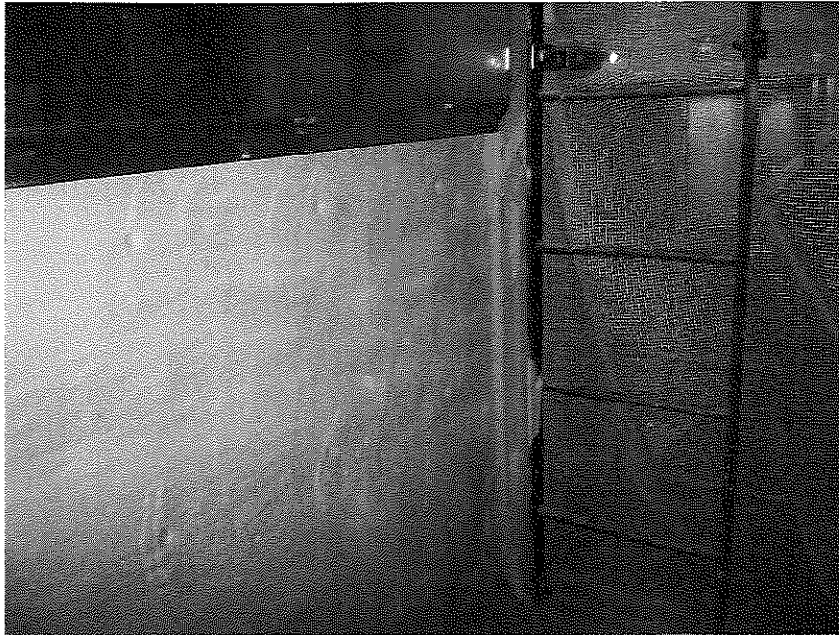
Vapor proofing material (Perm-A-Barrier Liquid) installed on walls (and base) of east elevator pit in the northeast portion of the building (facing southwest; February 6, 2015).
